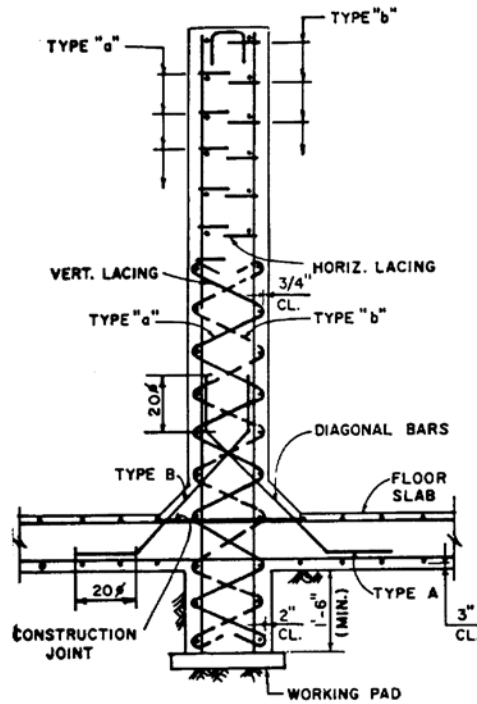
Cantilever reinforced concrete blast wall with lacing reinforcement. (U.S. Department of the Army, 1990)
